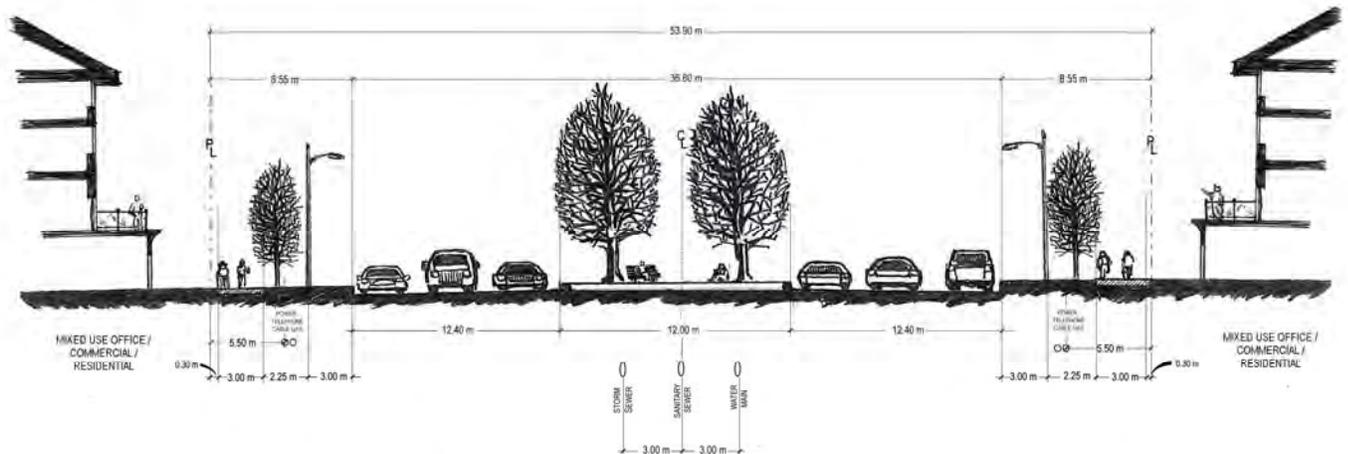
Cross section of Grand Boulevard; showing wide "park block" median
